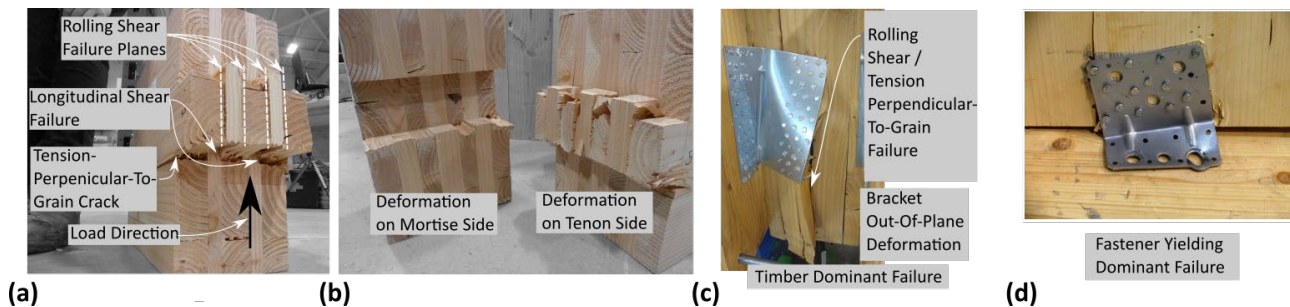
Failure photos: (a) castellation tenon failure modes, (b) castellation deformations, (c) angle bracket timber dominant failure, (d) angle bracket fastener yielding failure (Tomasi & Smith, 2015)
